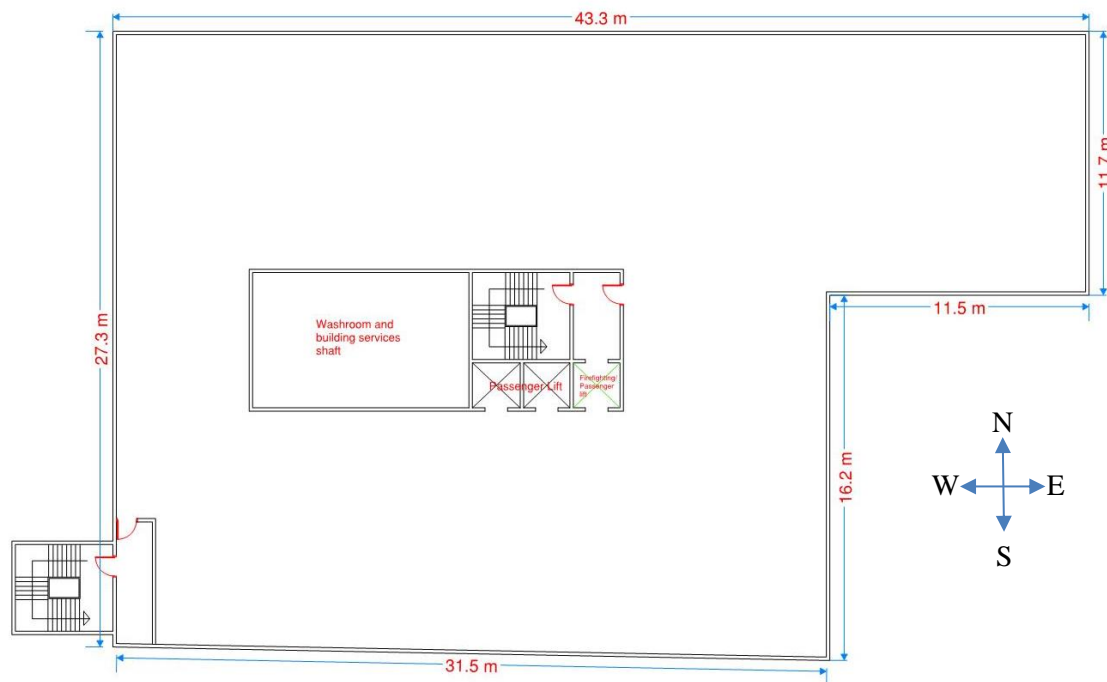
Floor plan of the sixth floor of office building considered for the study
